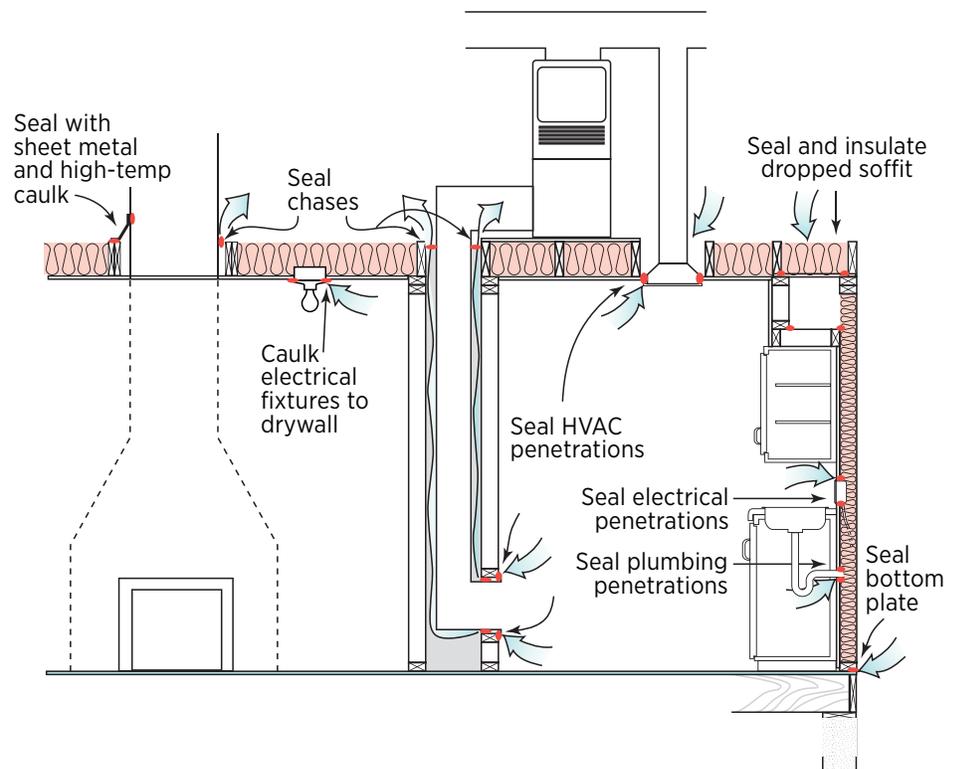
Seal attic and wall penetrations associated with mechanical ventilation systems, electrical chase openings, and dropped soffits (Source: DOE 2000a).
